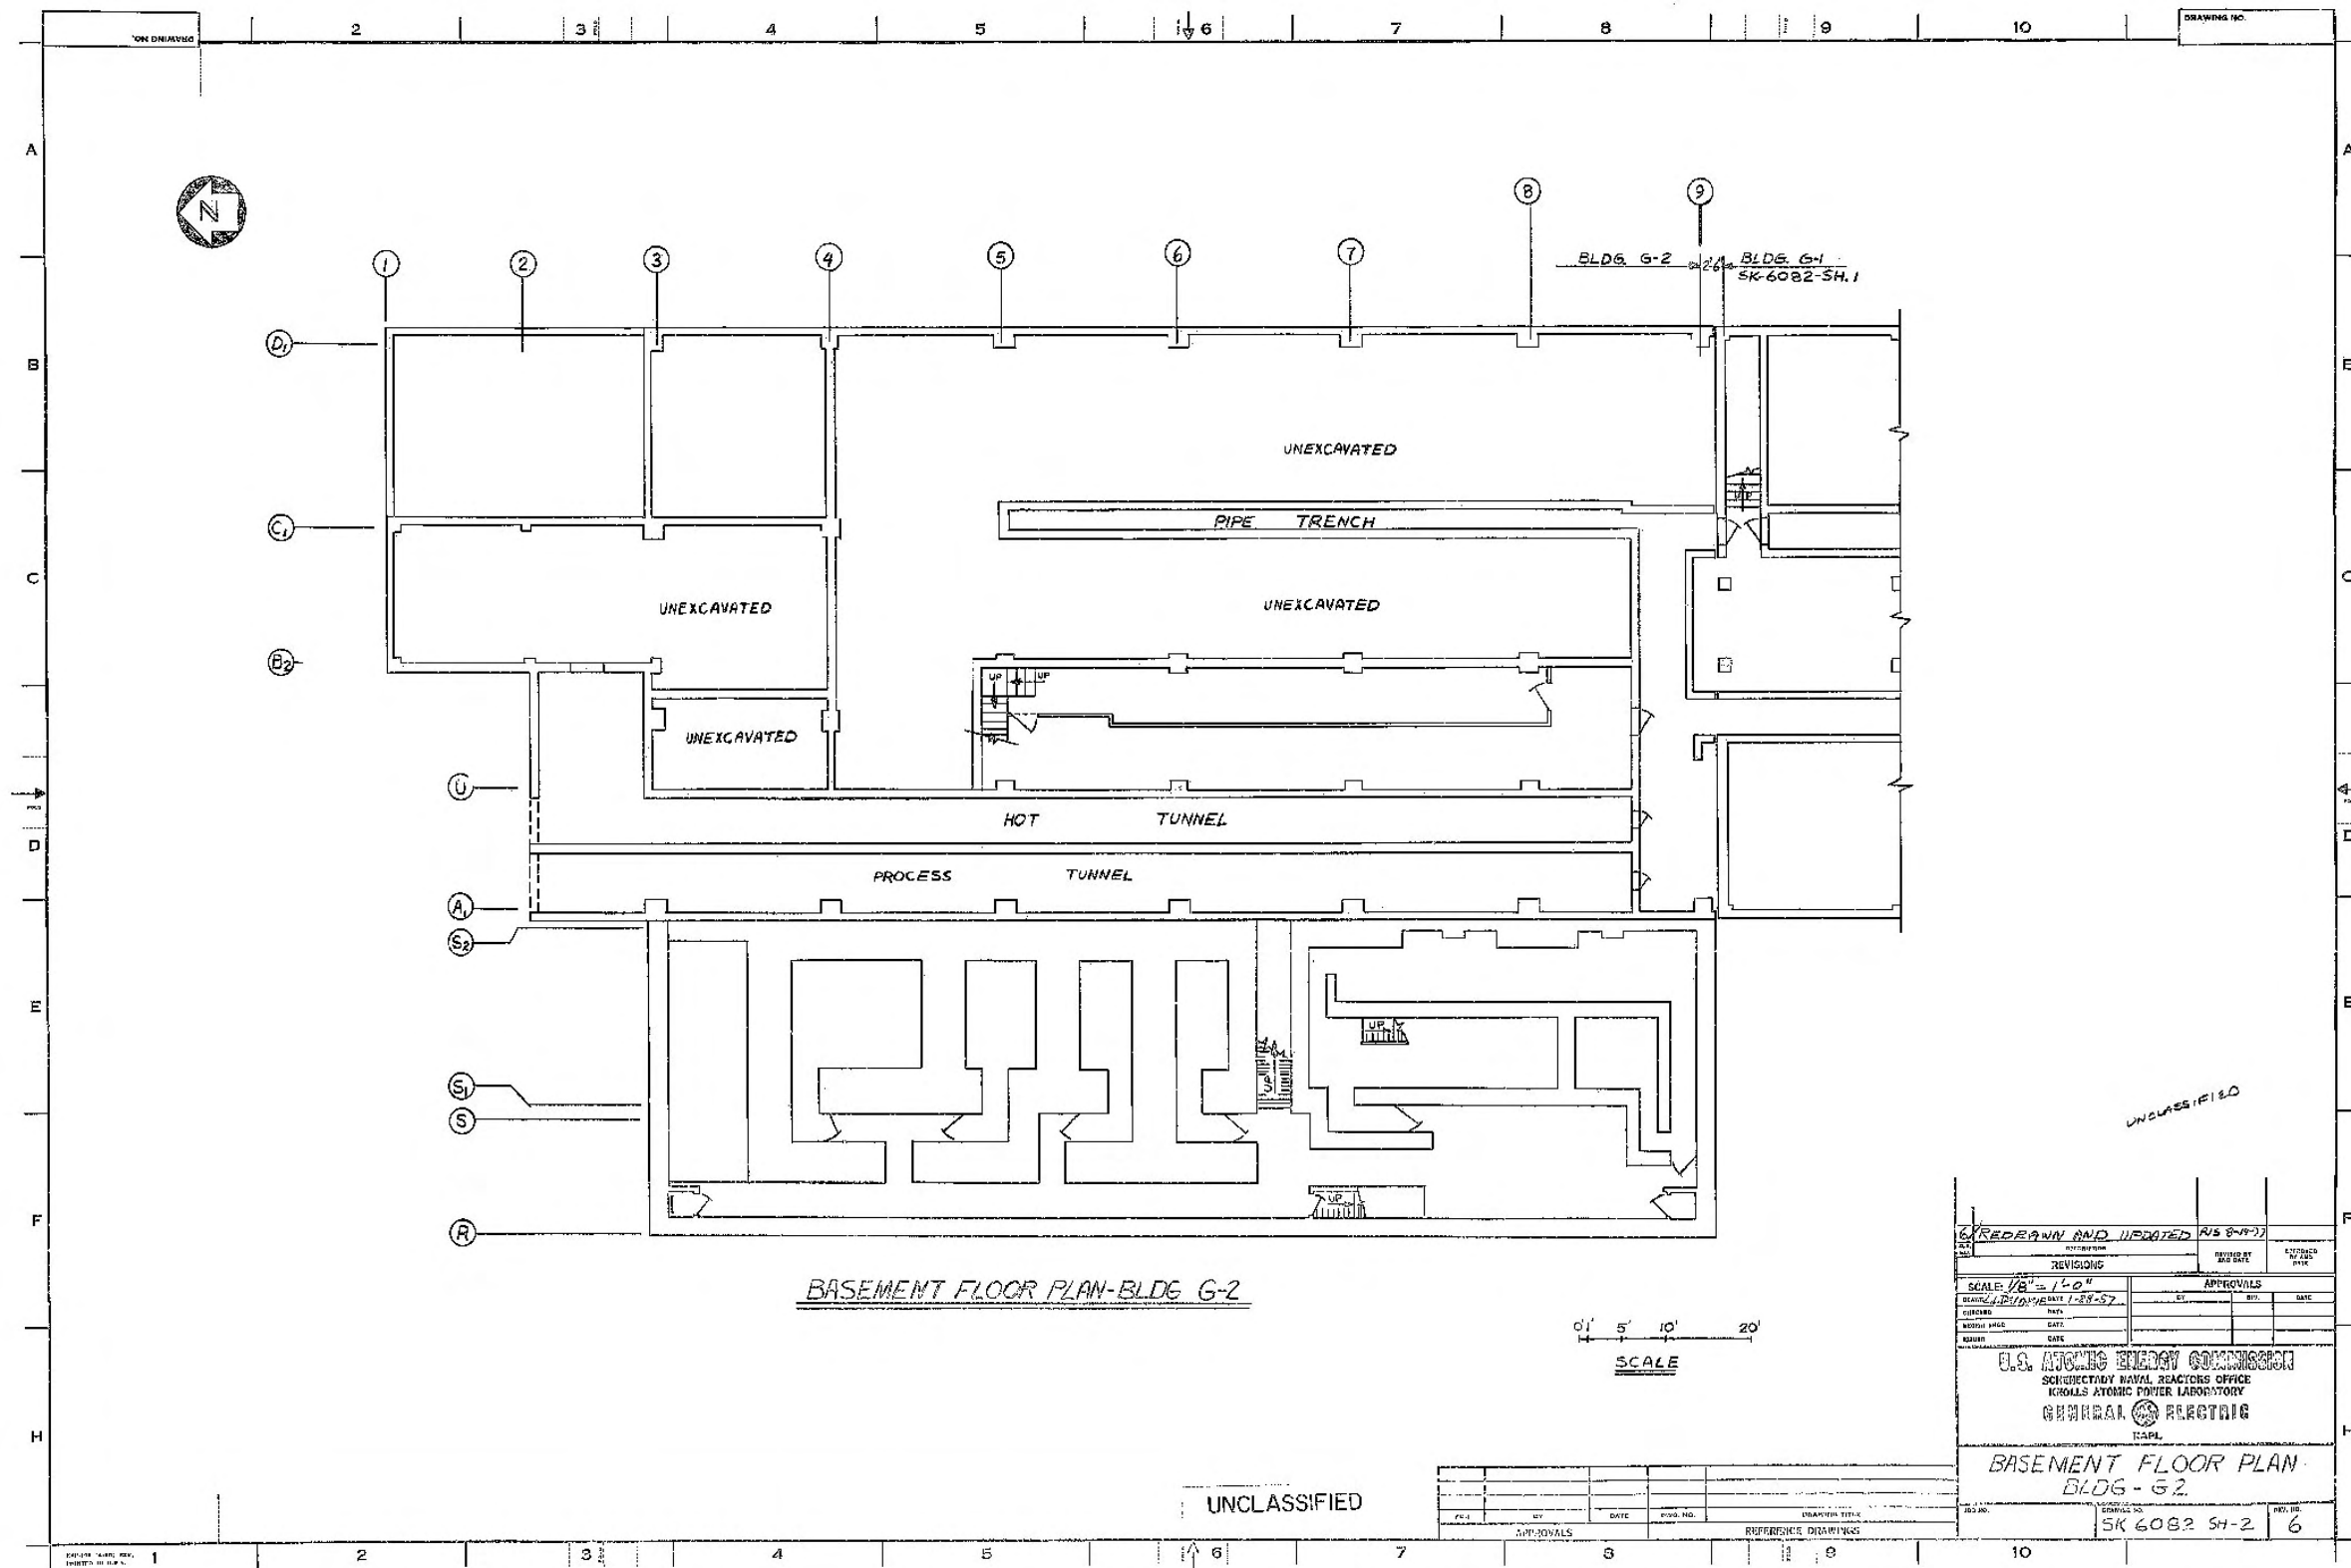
Drawing No. G-SF-1, Building G2 Basement Floor Plan Showing Pipe Trench, January 28, 1957
